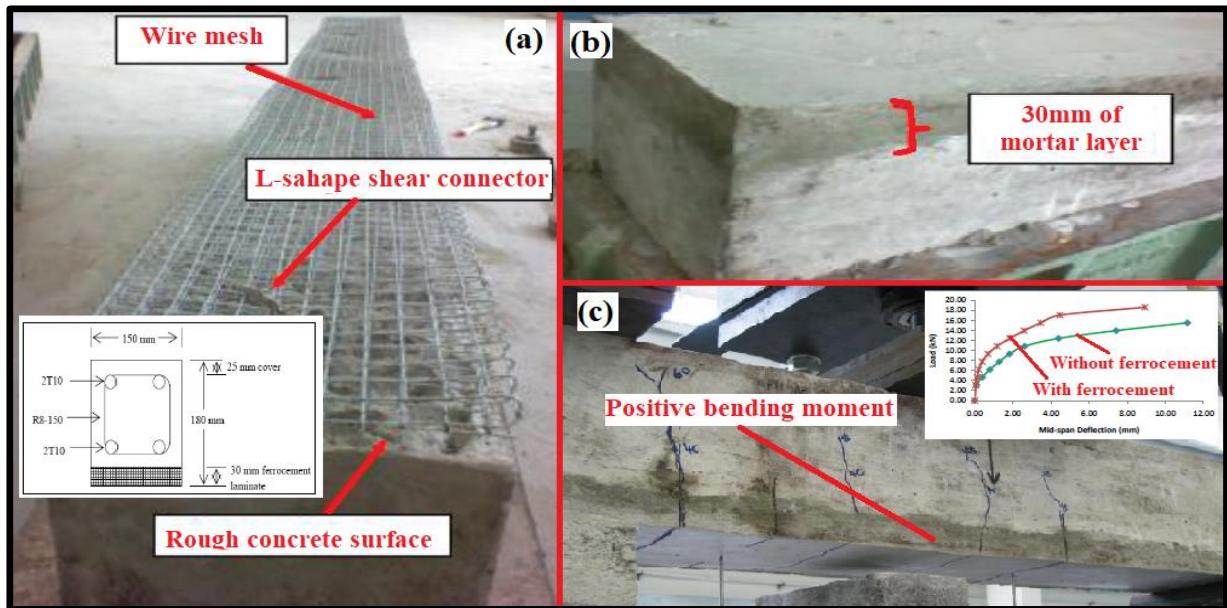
Reinforcement of a beam with ferrocement laminate (a- Placing the wire mesh, b- a view of after hardening, c- bending test and results) (Bong and Ahmed, 2010)
